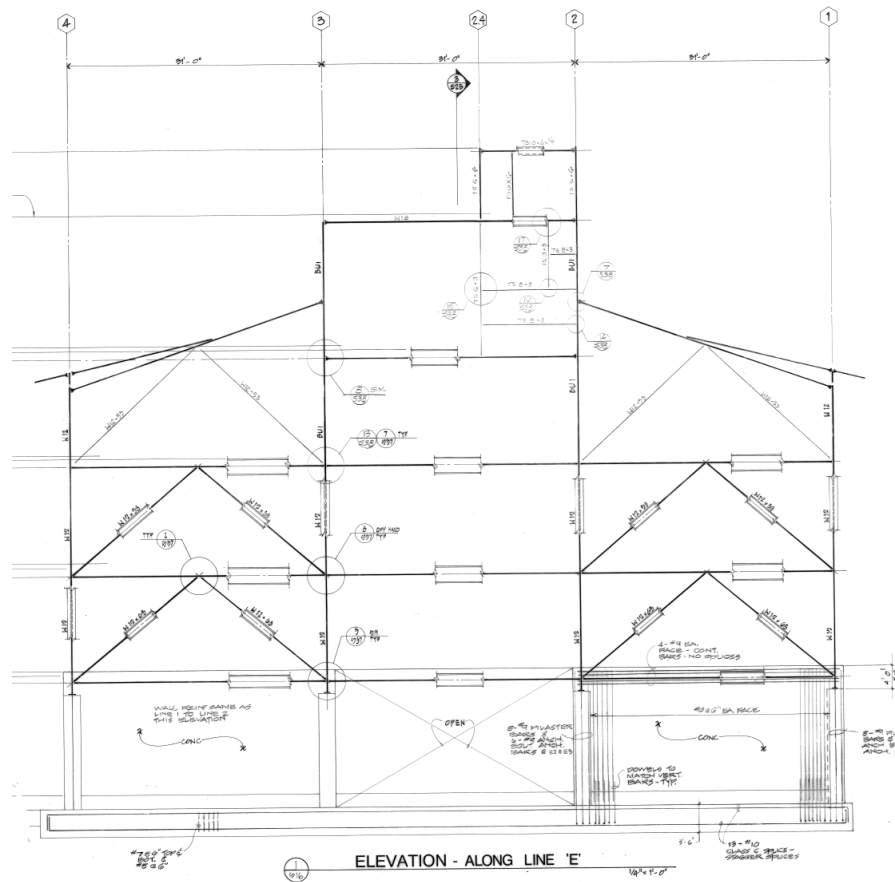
Longitudinal Frame Elevation (North Elevation)
